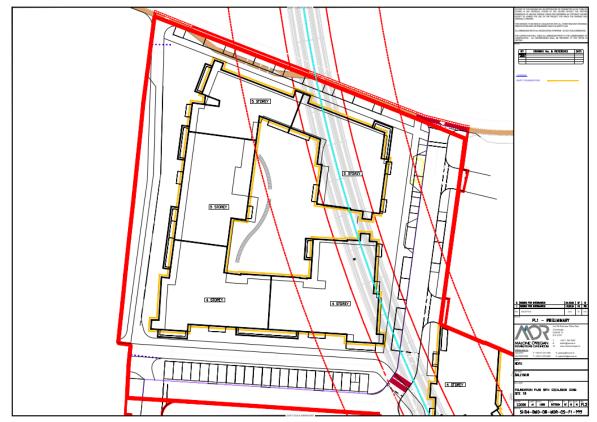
Foundation Plan with Exclusion Zone Site 18
